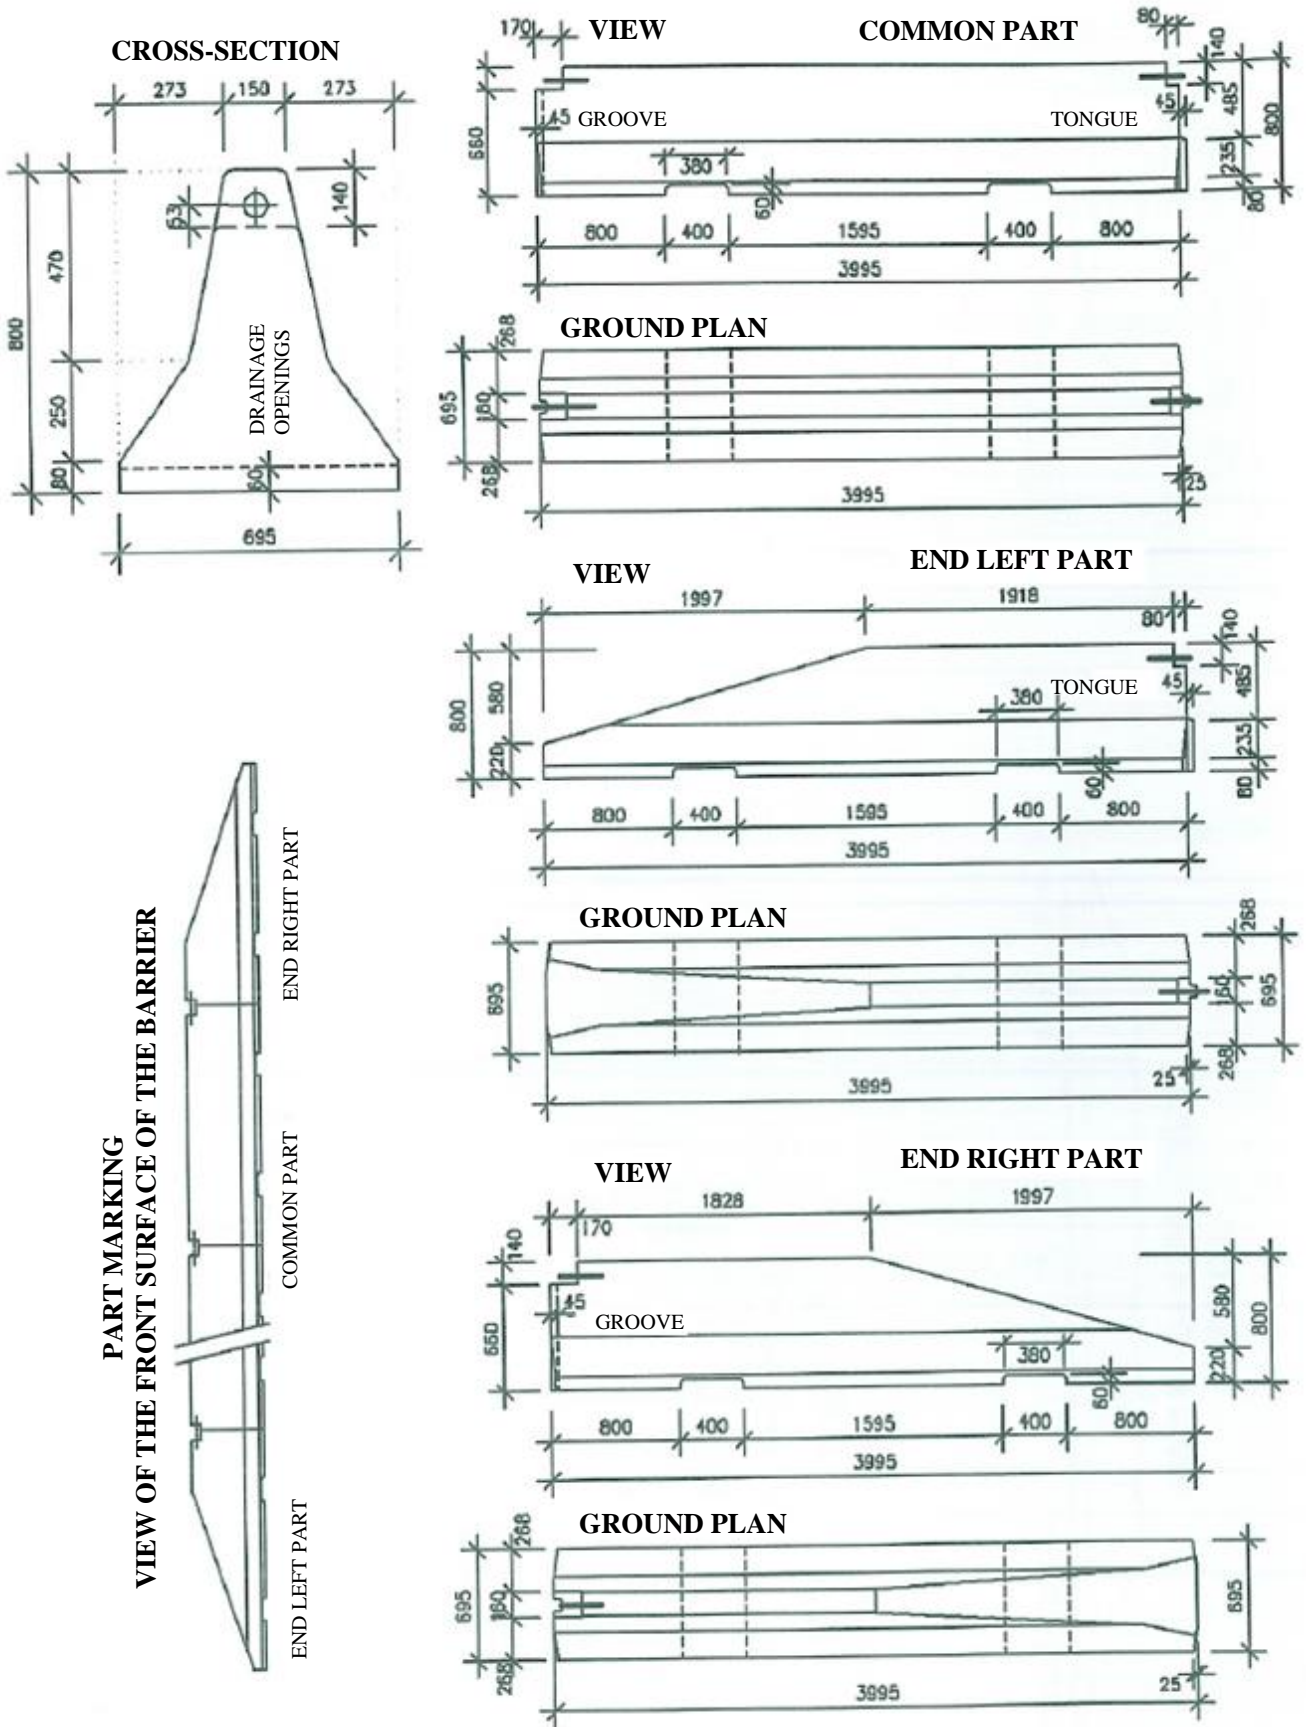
Double sided concrete barrier 0.8 m height – common and end part
